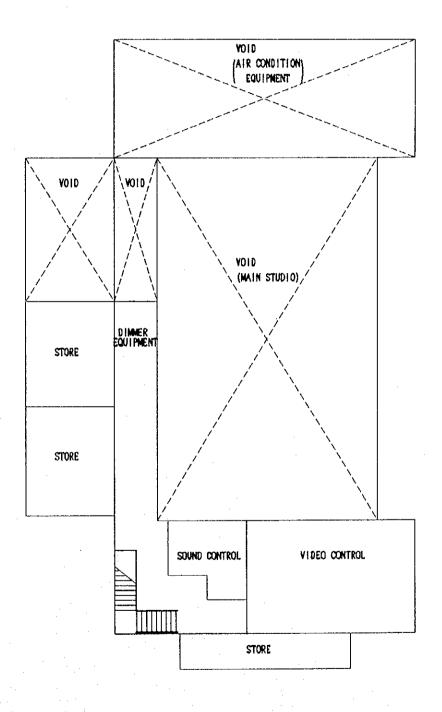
FLOOR LAYOUT OF KARUME HOUSE (2F)
